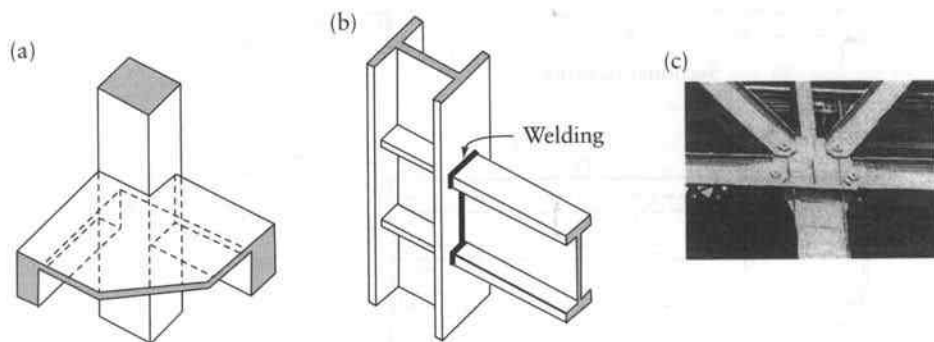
Connections. (a) Rigid connection of a corner column with slab and edge beams in a concrete building. (b) Rigid connection of steel column to beam. (c) Pin-connected truss members.
